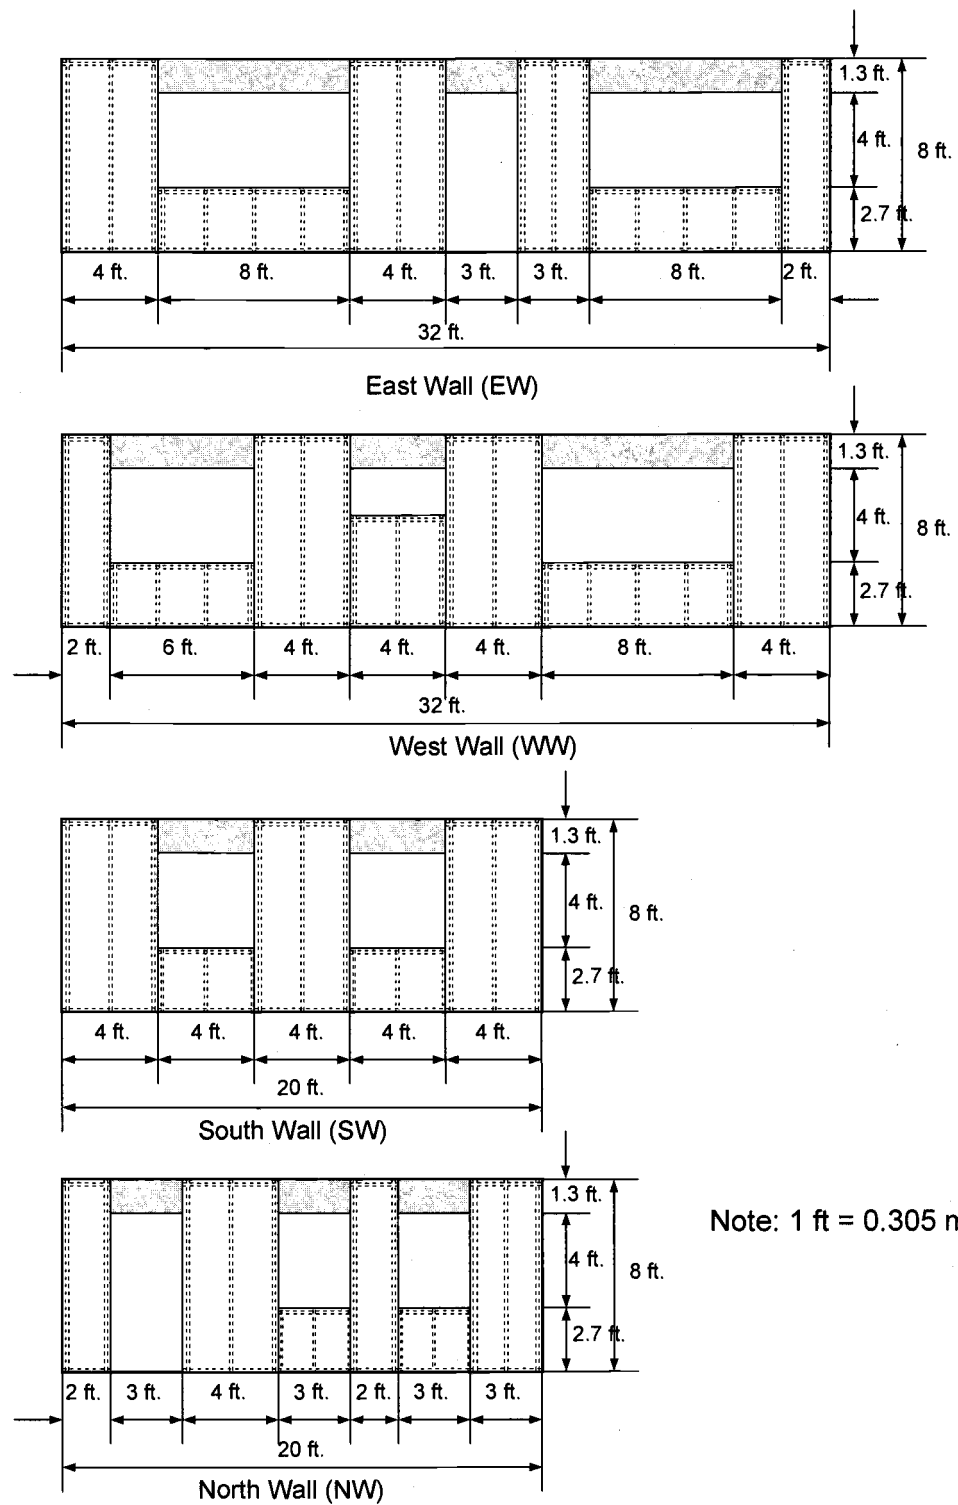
(b) - Detailed shearwall configurations for Type A structure
